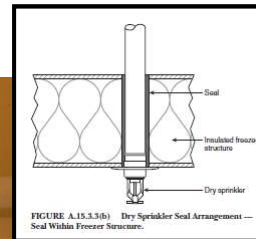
(b) Dry Sprinkler Seal Arrangement — Seal Within Freezer Structure.
